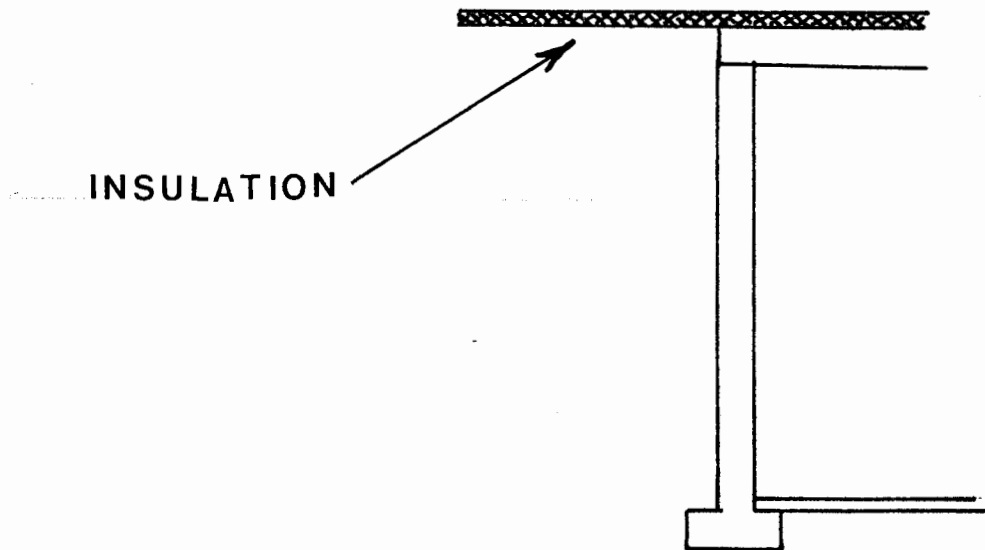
Wall Insulation (Wall Four) (Underground Space Center, 1978, p. 65).
